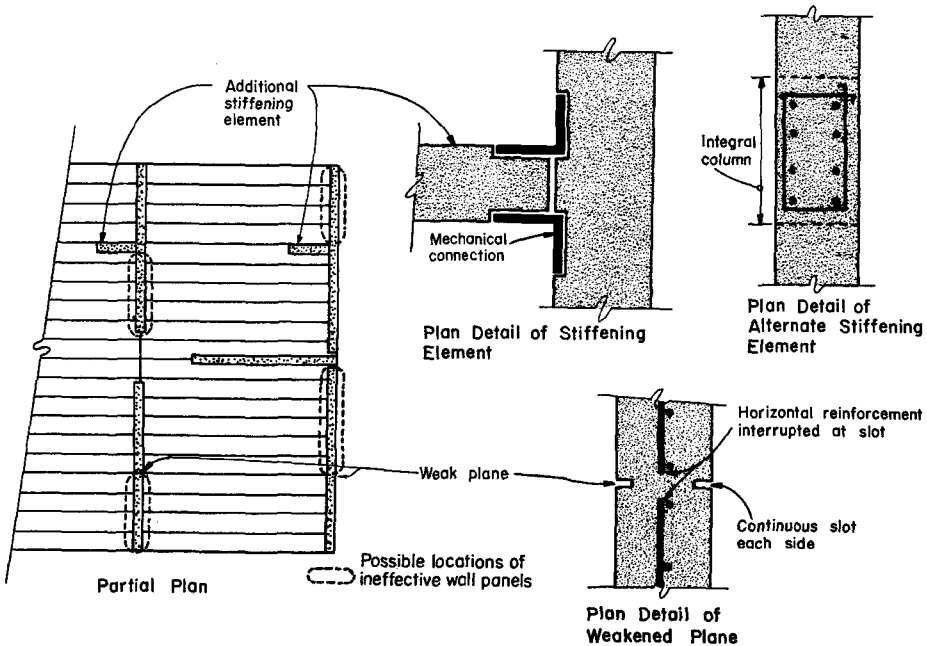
Extent of assumed wall damage under abnormal loads with limiting measures taken.
